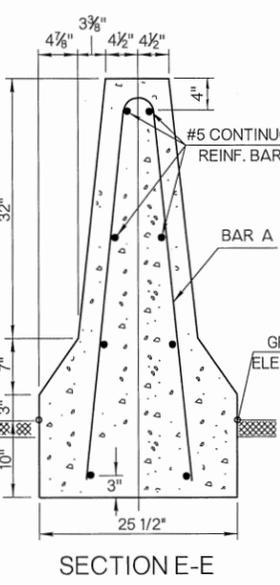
DETAIL OF TRANSITION SECTION AT BRIDGE PIERS
